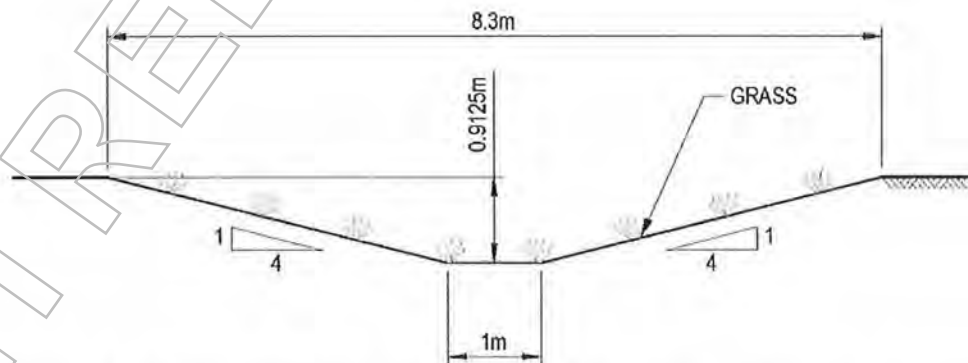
Proposed typical cross sections for the proposed open channels at location A (in Figure 8-10)
